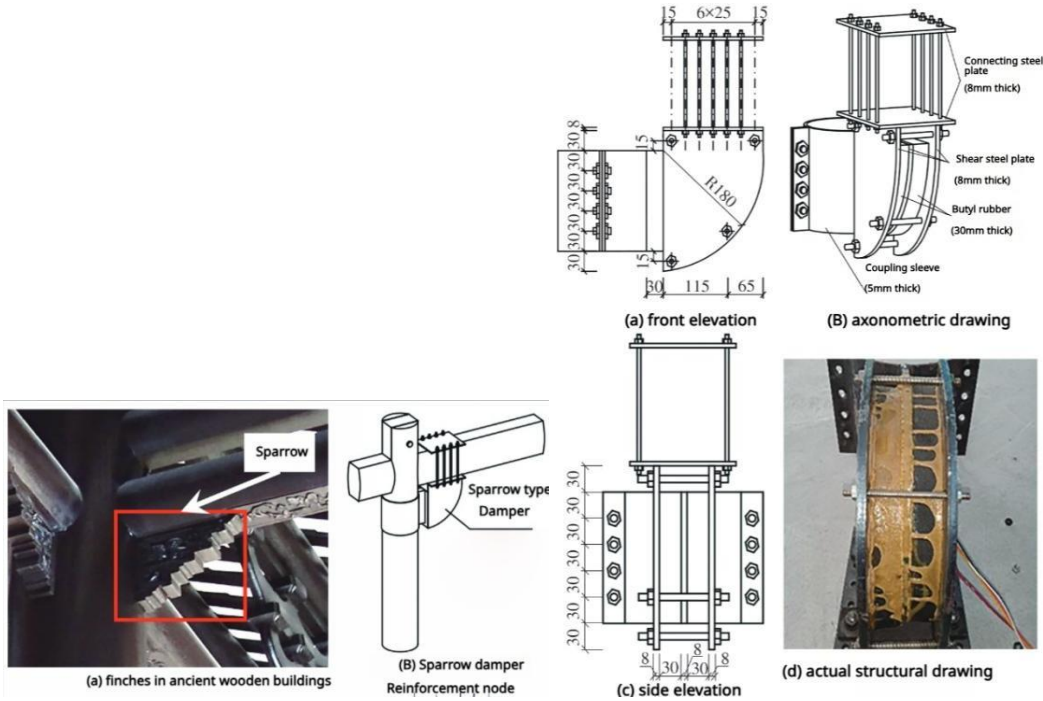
Test subjects and devices of sparrow-brace dampers reinforcement (Chen Qingjun et al., 2023) [8]
